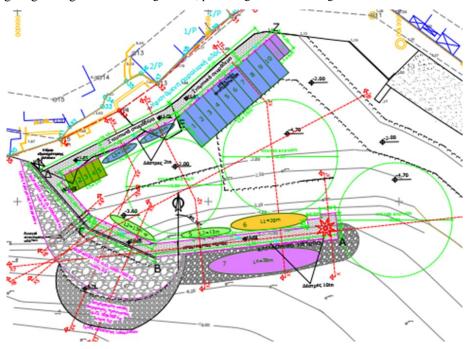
New fishing shelter's design, following sea bottom's contours, minimizing construction material. The docks are protected by natural stones, reducing wave reflections
